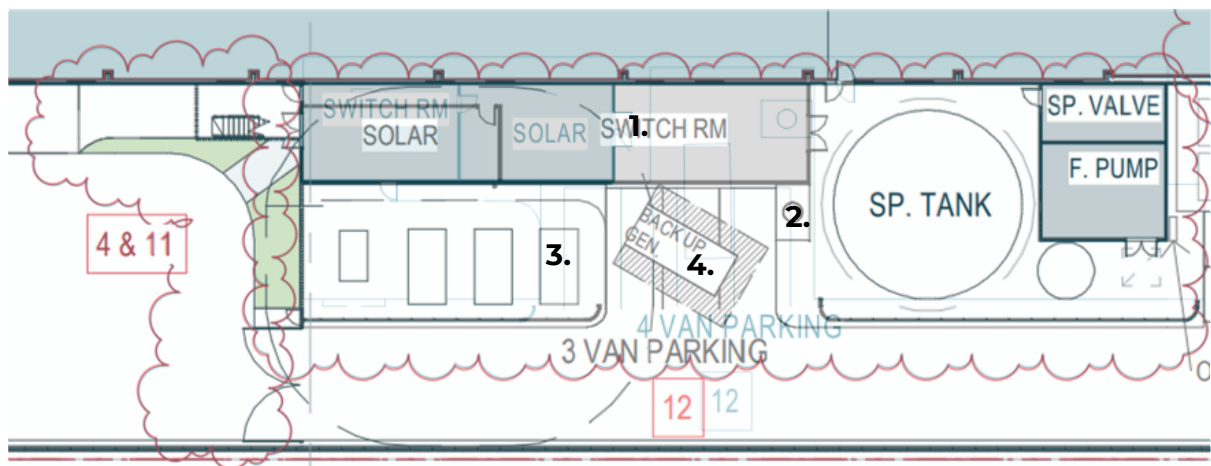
REVISED PLANT AREA LAYOUT (SOURCE: NETTLETON TRIBE, 2022)
